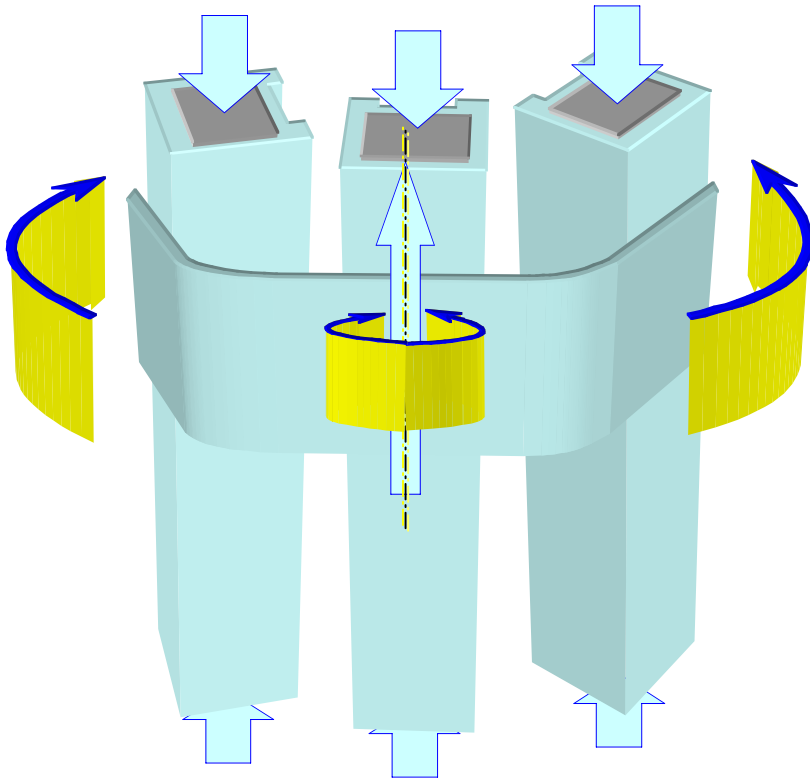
In a gravity collapse, the outer columns are essentially subjected to no loading in this direction.
